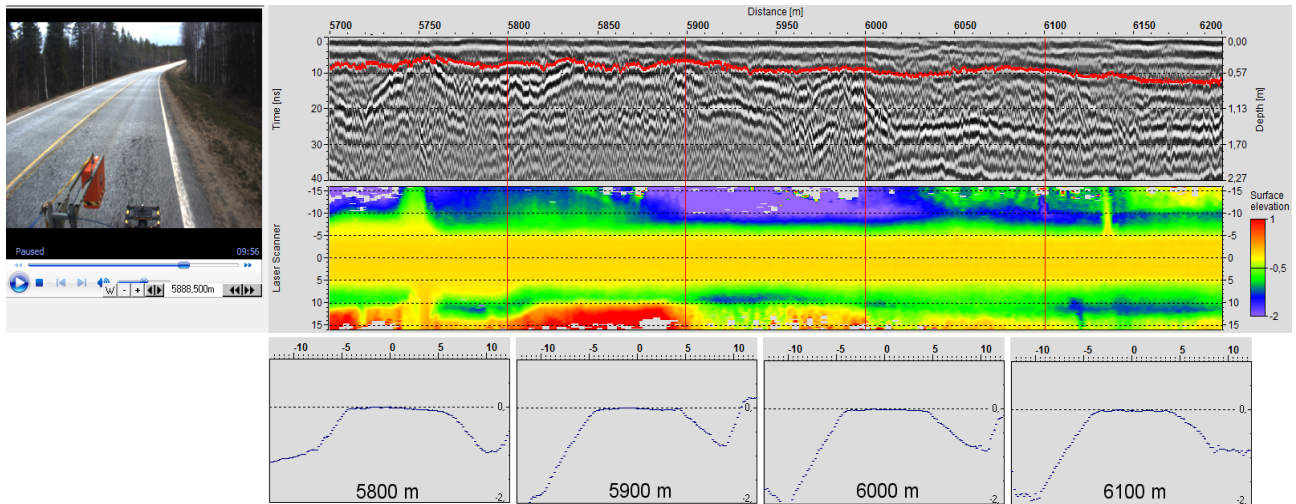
11. An example indicating the reasons for the typical alligator cracking damage on Road 75. The total thickness of the road structure is very thin. Drainage is not working properly due to the upper ditch on side sloping ground being too shallow. The top field gives the 400 MHz GPR data, the middle field is the laser scanner height map, and the lowest field presents laser scanner cross sections. The red lines show the locations of the cross section profiles. The video still photograph on the top left is from chainage 5890 m.
